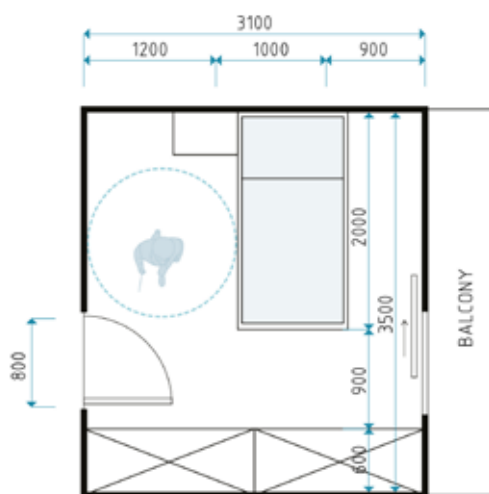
Illustrative floor plan of an accessible bedroom with a single bed (Lacho, Suláková)
